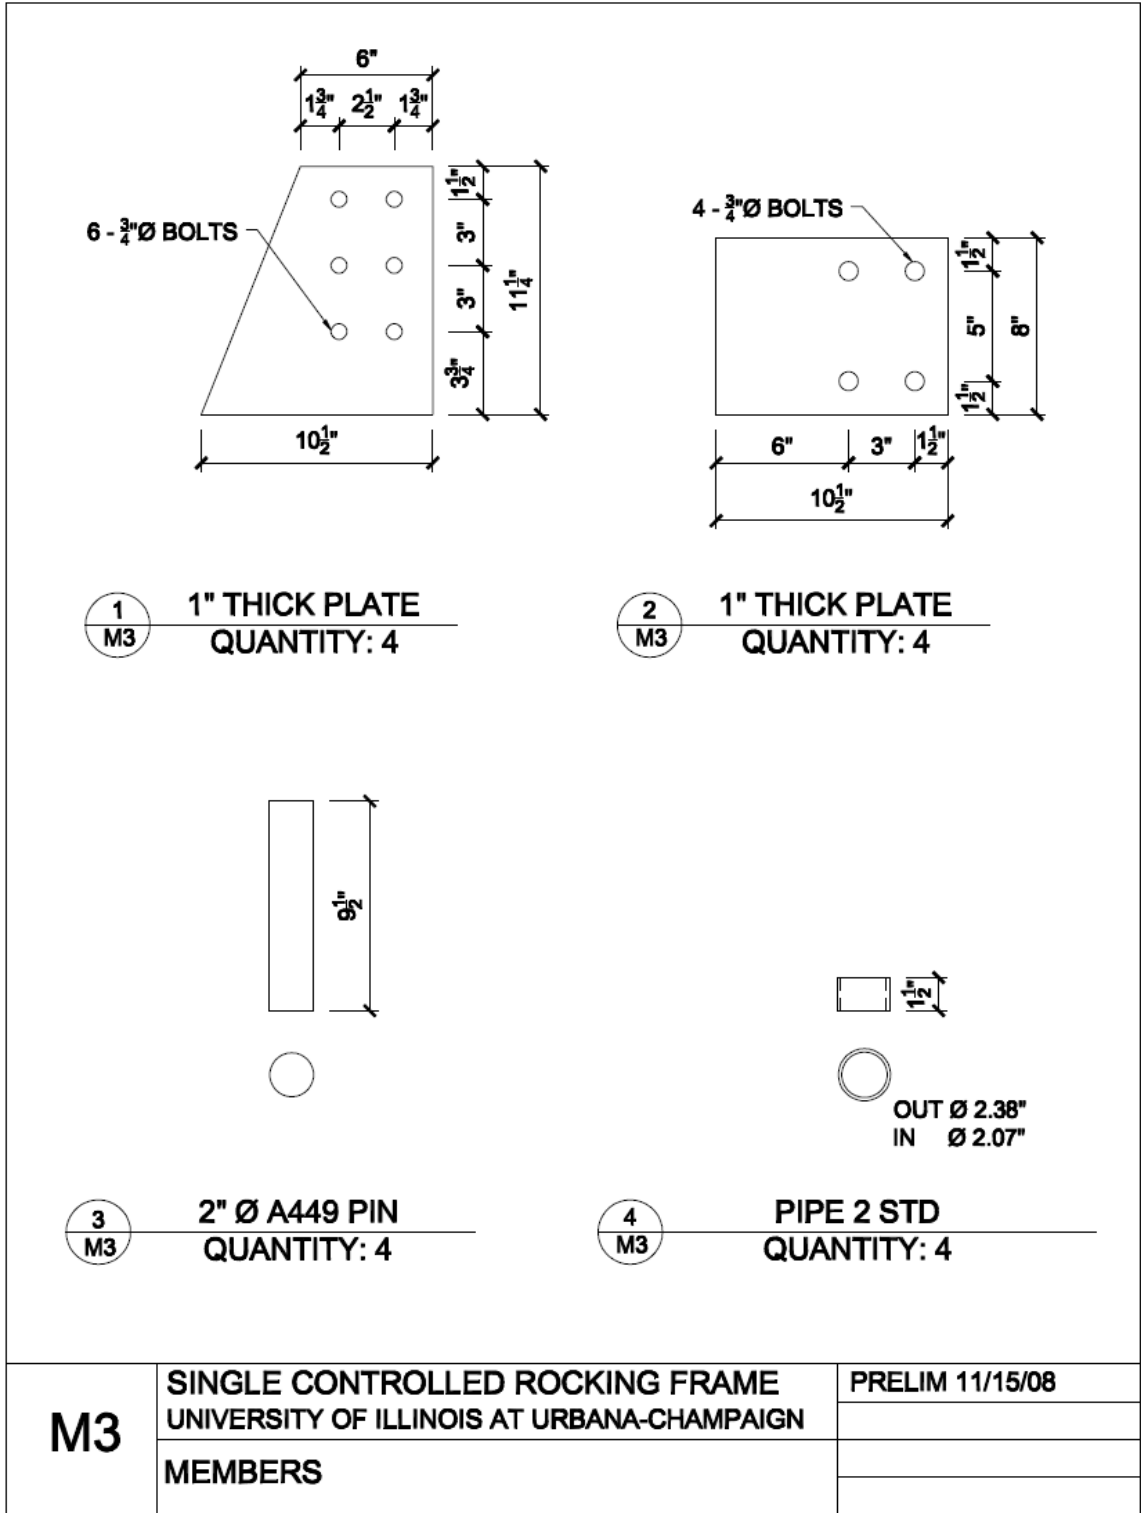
Design Drawing for the Single Frame Configuration – Fabrication Pieces
